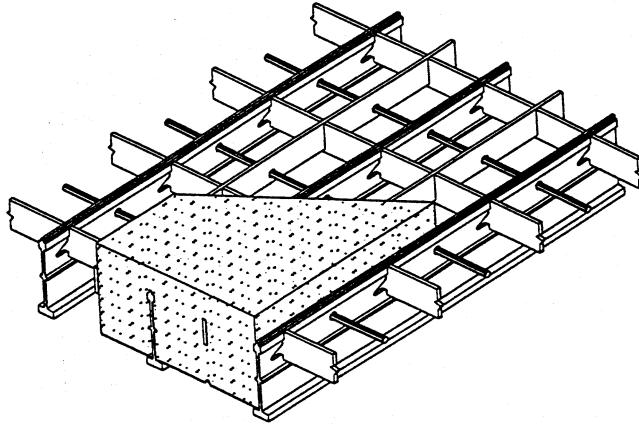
Steel grid bridge deck. (From American Grid, *Weldless Bridge Deck Systems*. With permission.)
